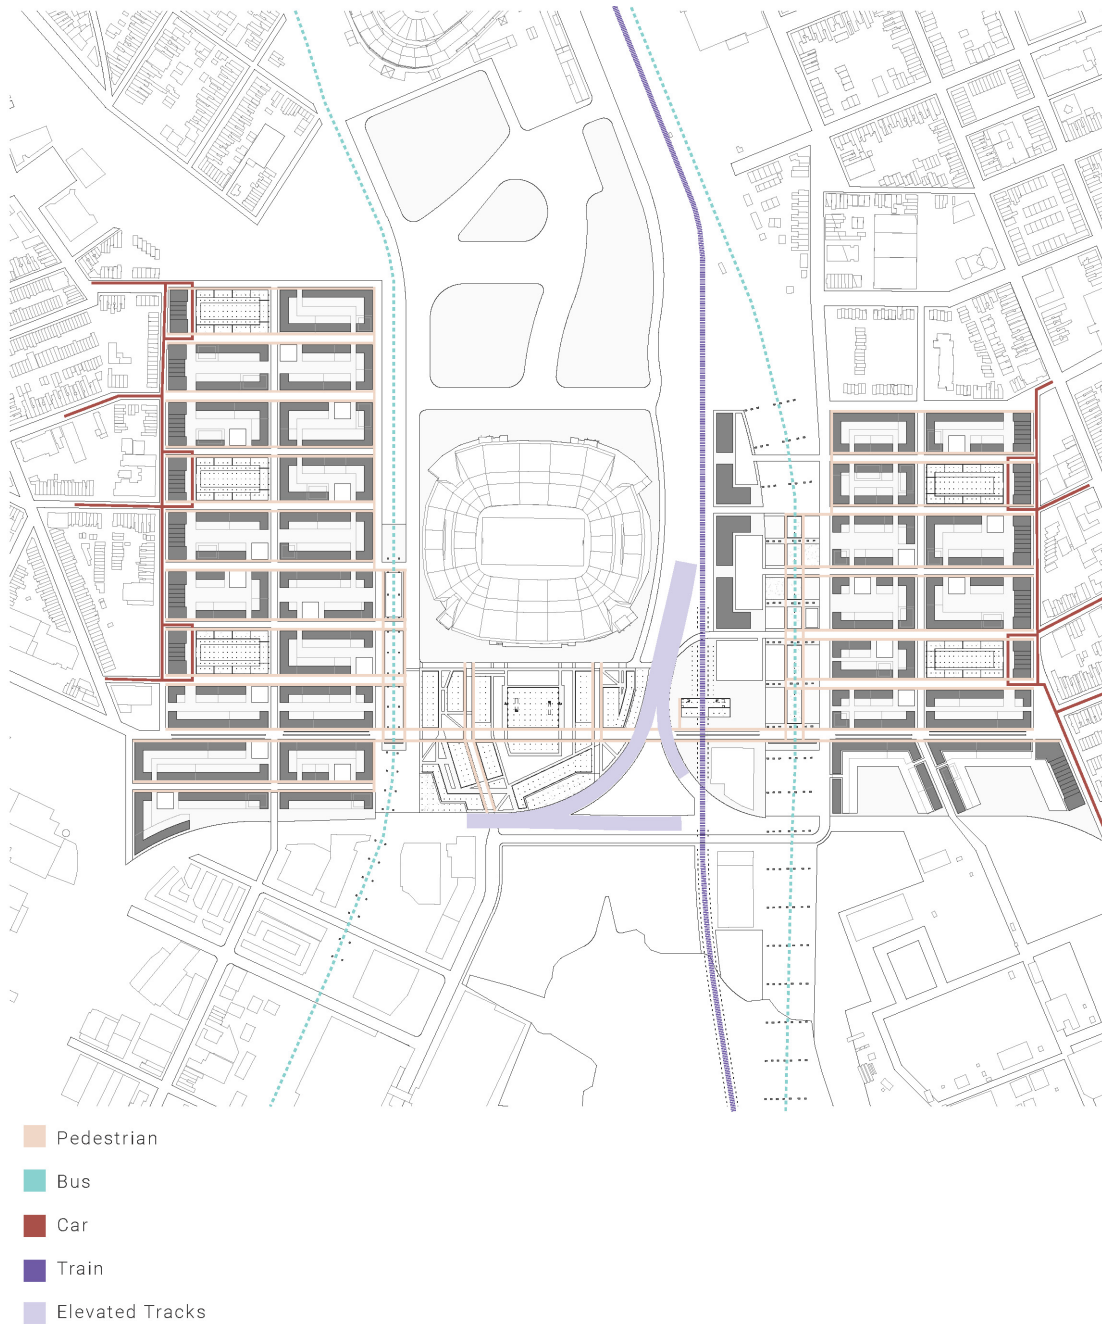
, Master Plan - Site Plan - Circulation (Source: Drawn by Author)
